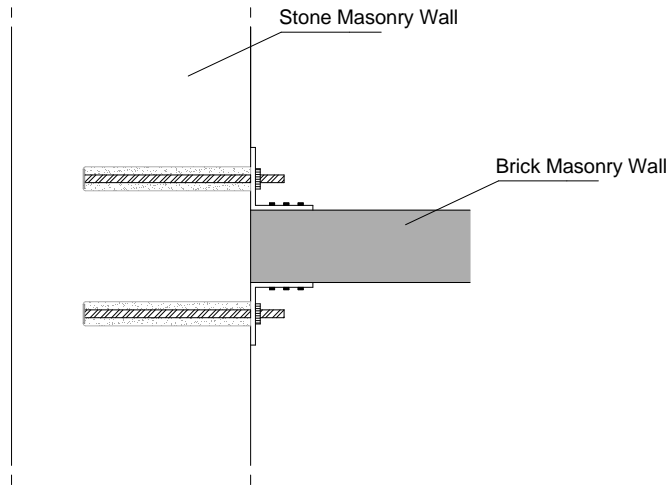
Wall-to-wall strengthening solution (plan view).
